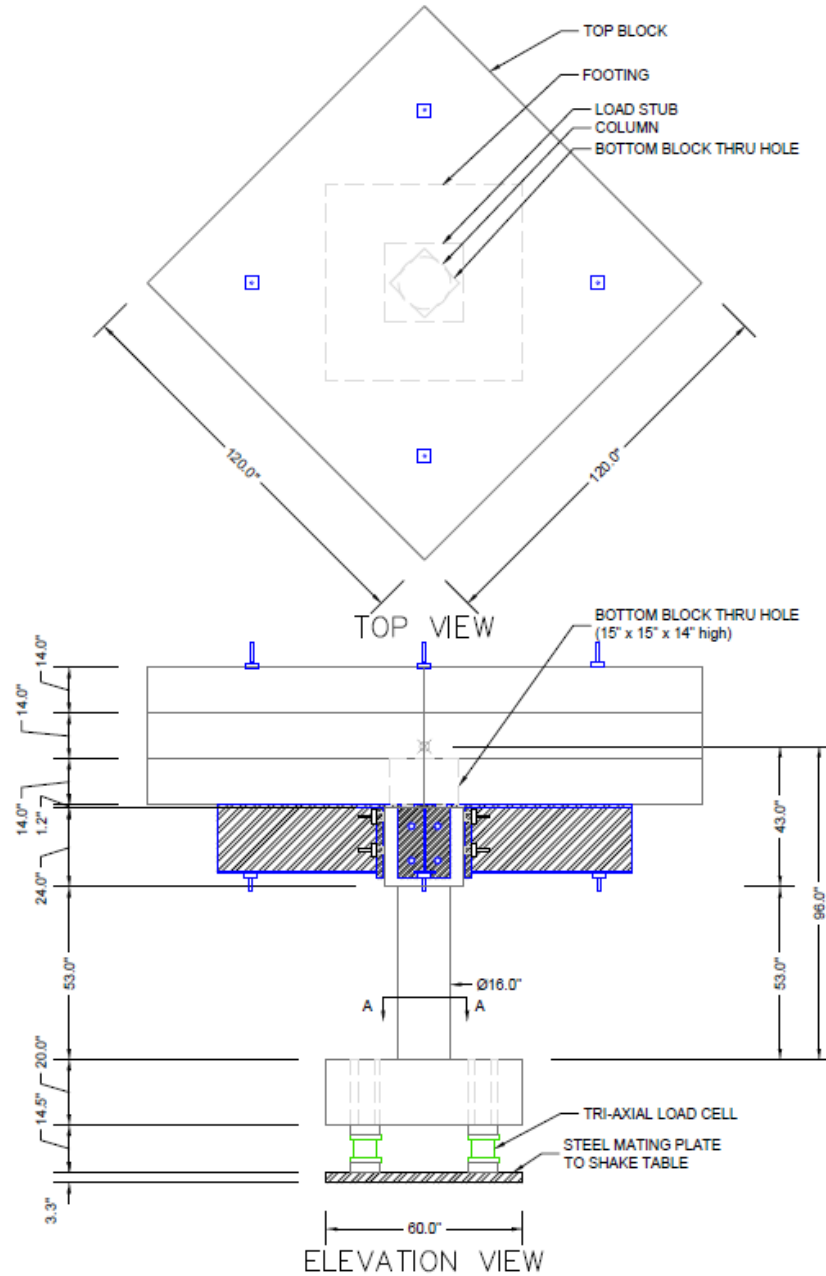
Conventional cast-in-place shake table specimen: elevation
